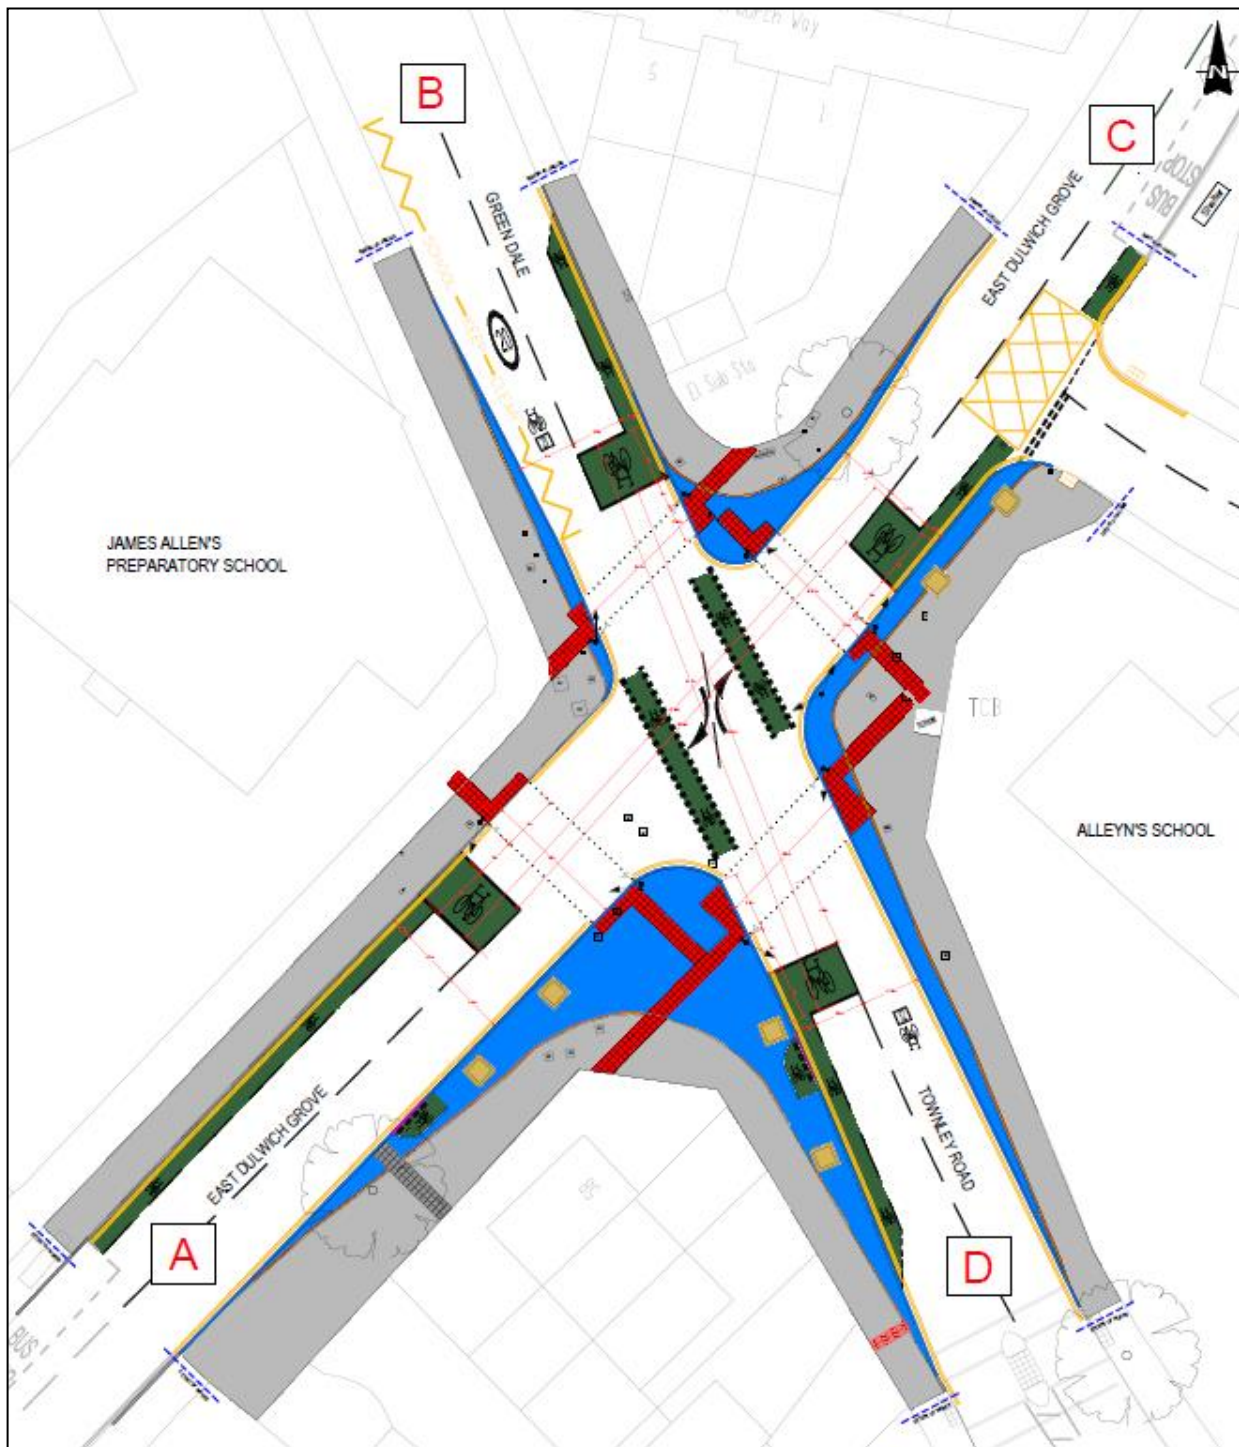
Figure D – Detailed Design Drawing of Option 2B No. D/EDG/CM/13/001/O3
